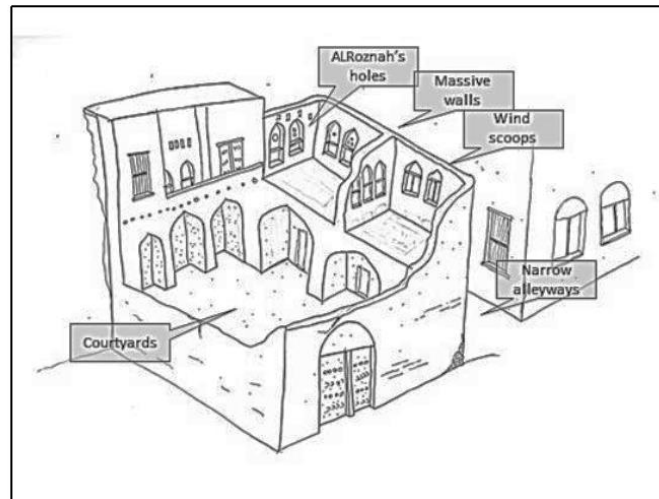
A section shows the wall thickness and Al-Roznah in an old Omani house
